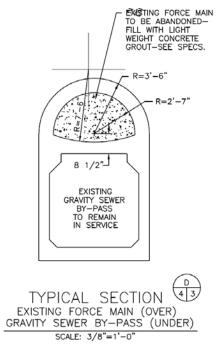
Pump Station Piping, 68-inch by 70-inch Bypass Rectangular Pipe (Source: Portland 1993)
